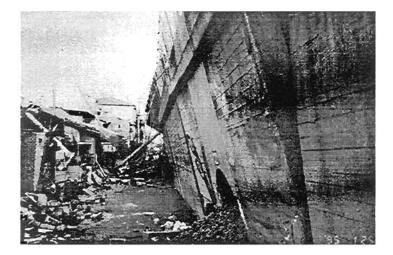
Tilt of a concrete gravity retaining wall (photo by Prof. J. Koseki)
